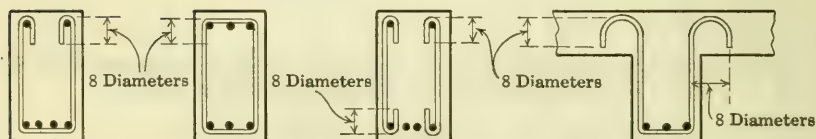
TYPICAL METHODS OF ANCHORING VERTICAL STIRRUPS.
